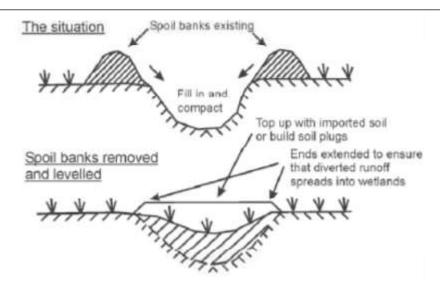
Example to backfill a drain / gully (Russell, 2009)
